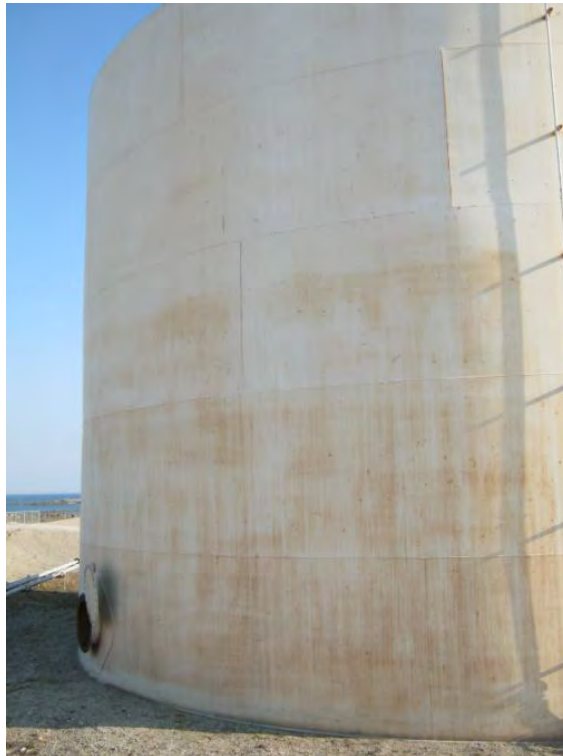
Tank 3 Exterior View – Protective coating worn, light rusting.
